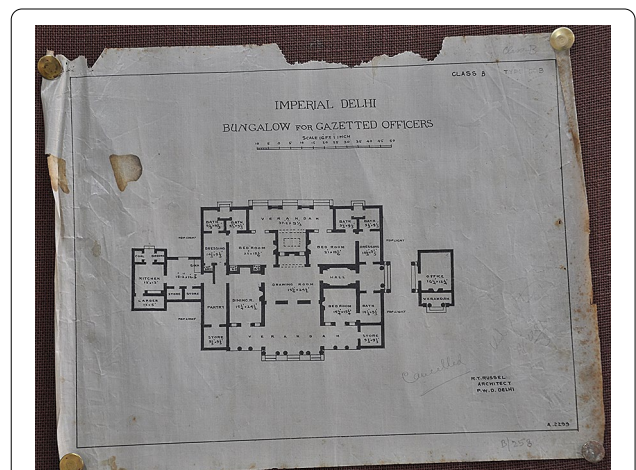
Bungalow for gazetted officers class B (ground floor plan) signed by R. T. Russell, c. 1935–9 (Archive CPWD/INTACH; image property: Pilar Maria Guerrieri)
